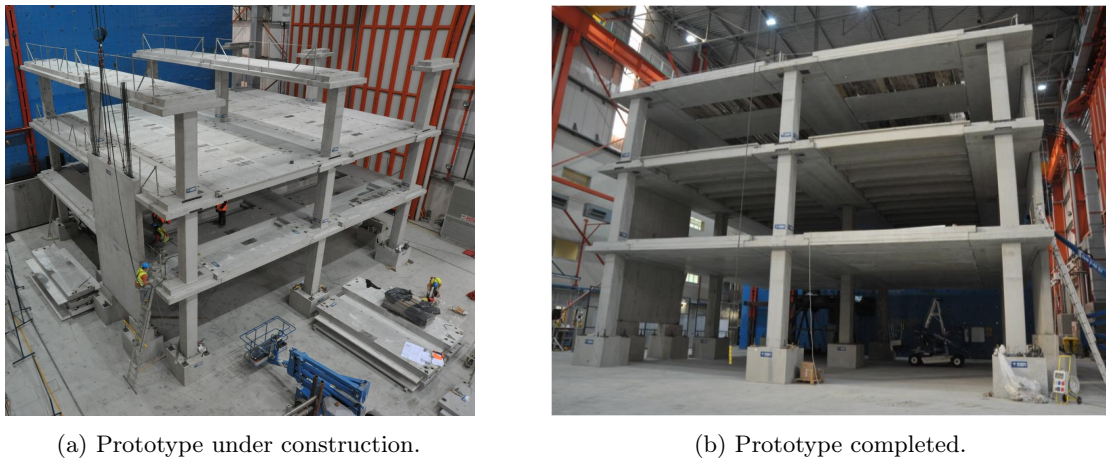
Safecast structural prototype tested at ELSA laboratory.
